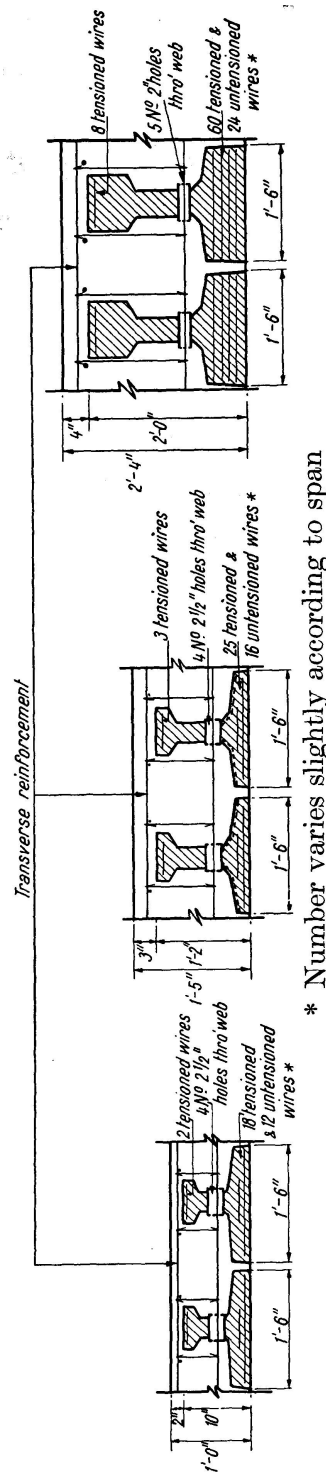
Standardised partially prestressed composite bridge slabs (cross section of 3 sizes)
